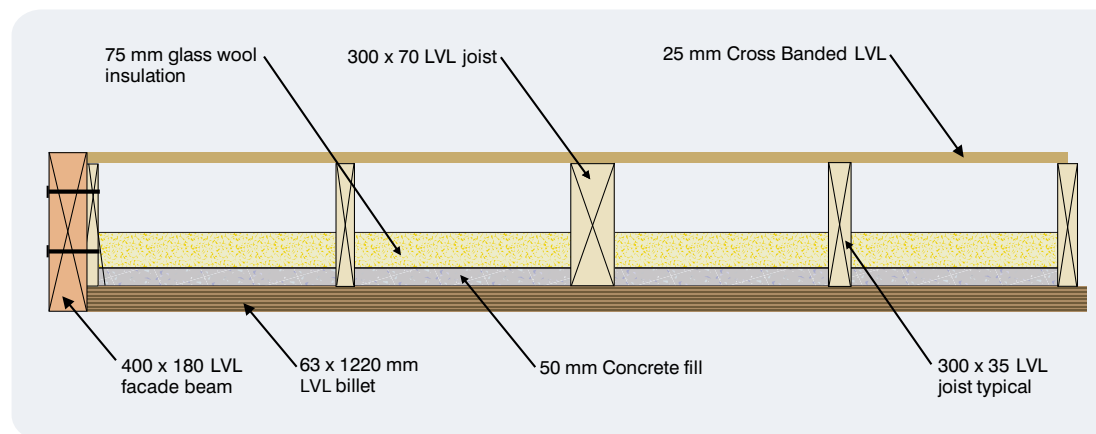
Cross-section of LVL floor cassette with perimeter beam attached.
